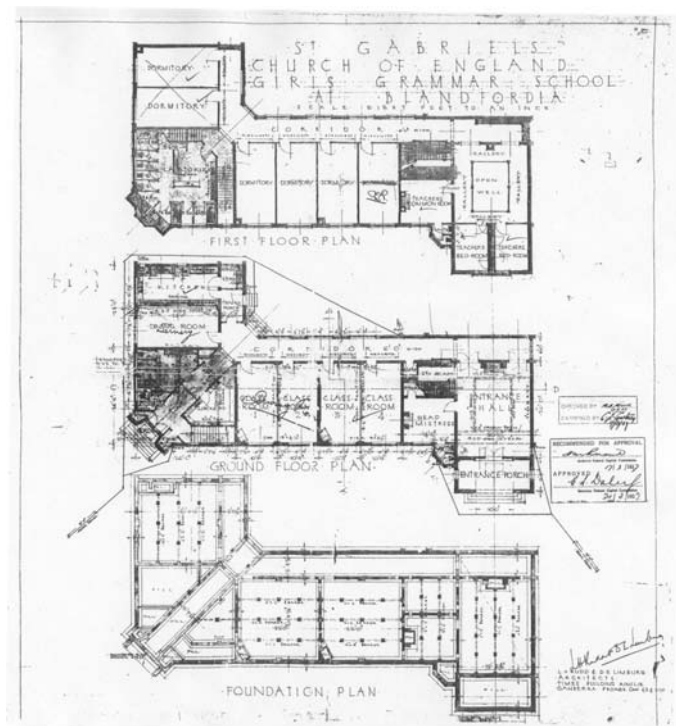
Original plans of Canberra Grammar School Boarding House (National Trust of Australia (ACT) files)
